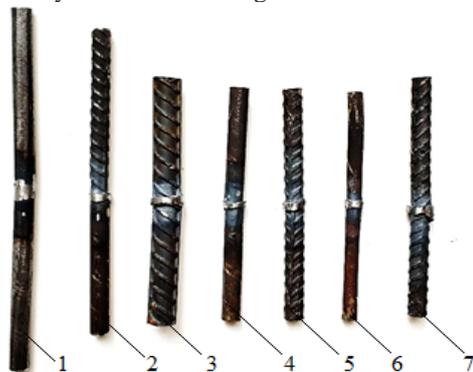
Samples of reinforcing bars joined by flash butt welding.
